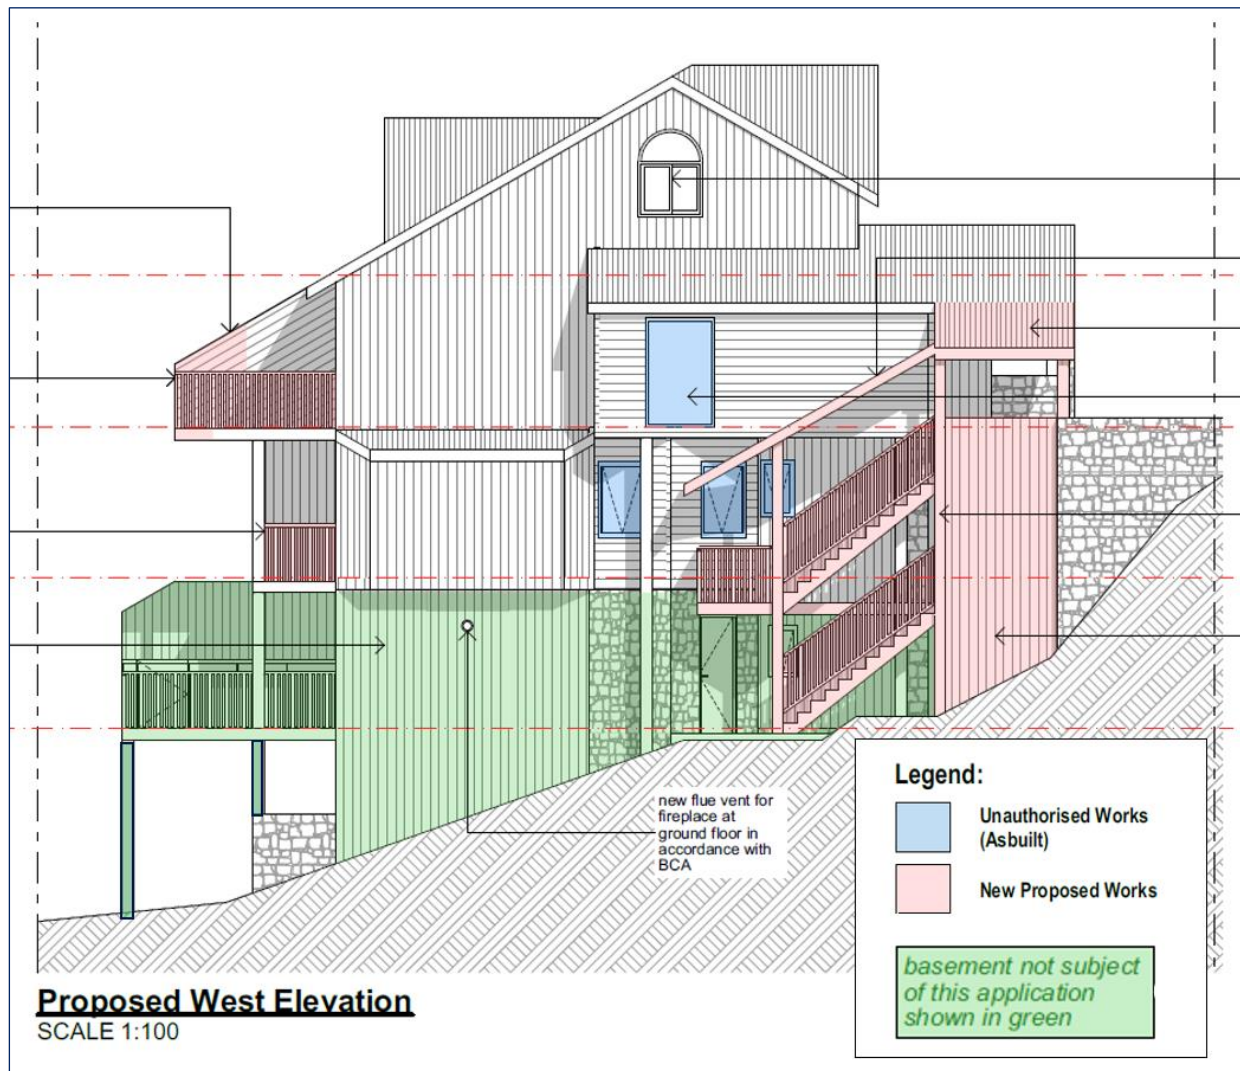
| Proposed modification works: highlighted in red (Source: Applicant's documentation)
